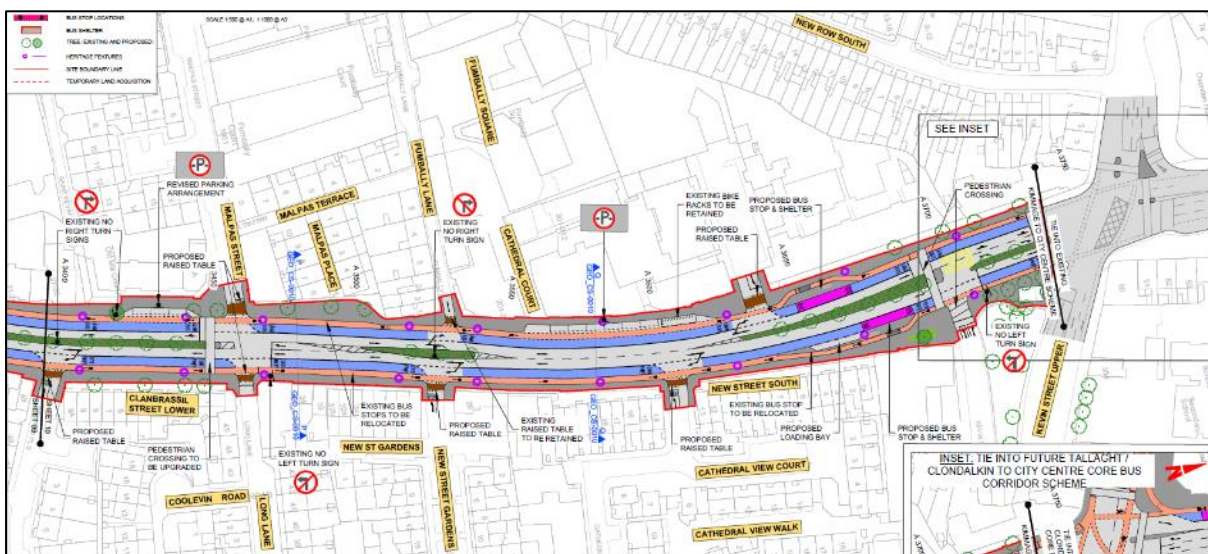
Extract from General Arrangement Drawings (Sheet 10)
